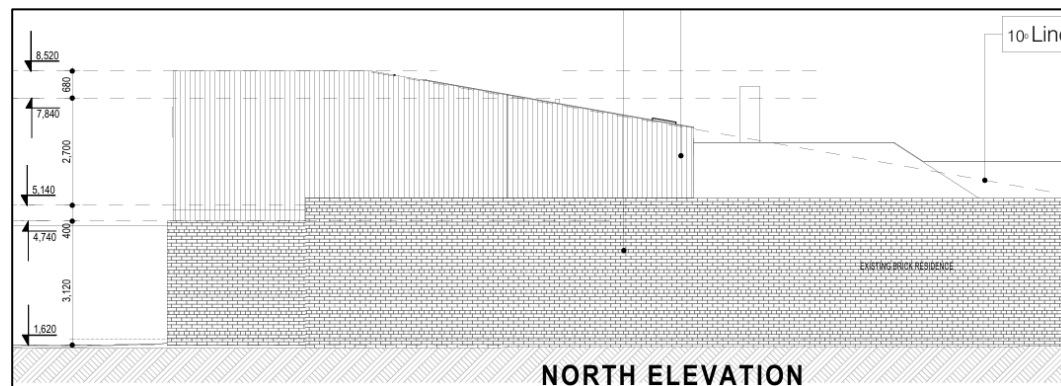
Extract of the endorsed north elevation of 8 Lytton Street, Elwood, illustrating a double-storey boundary wall approved along the northern boundary adjoining 7 Lytton Street, and featuring a similar articulated form and sloped roof profile
